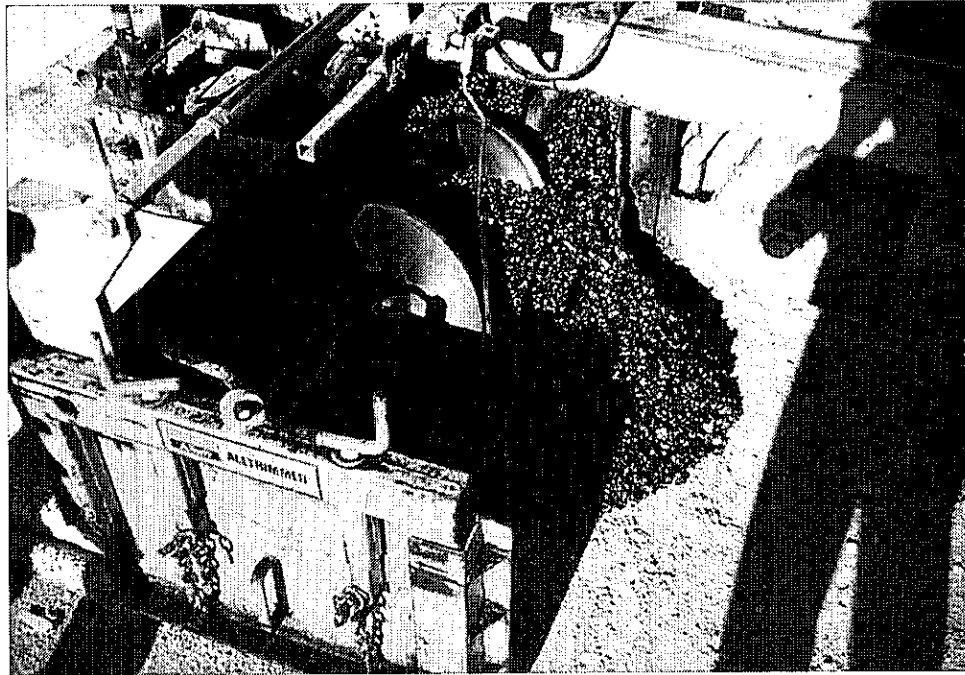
Asphalt paver used to place most of the drainage layers in the LaSalle/Peru test sections.
